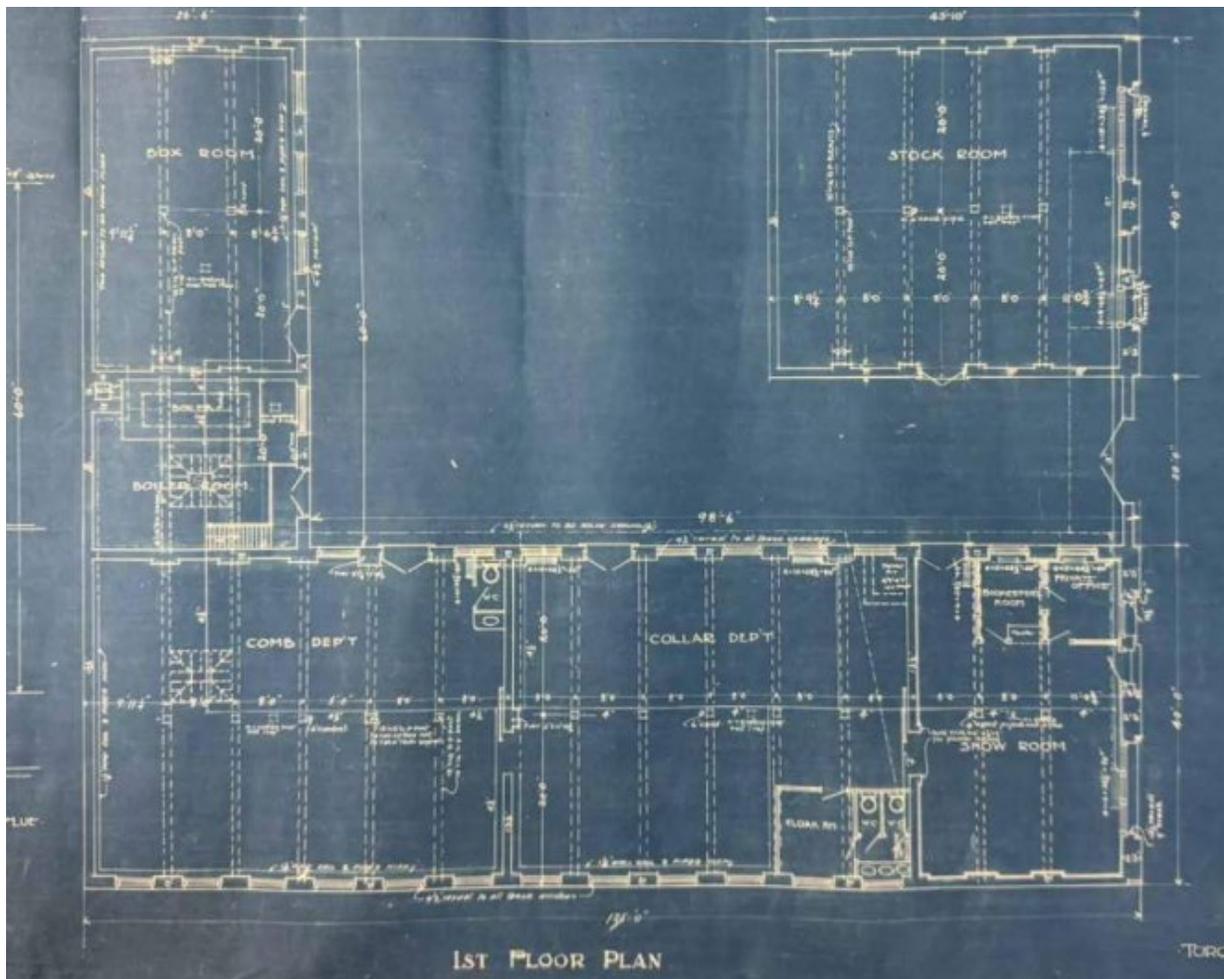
Architectural drawings of the first-floor plan, September 1905, City of Toronto Archives. (Giamo and Associates Architects Inc., *Heritage Impact Assessment*)
